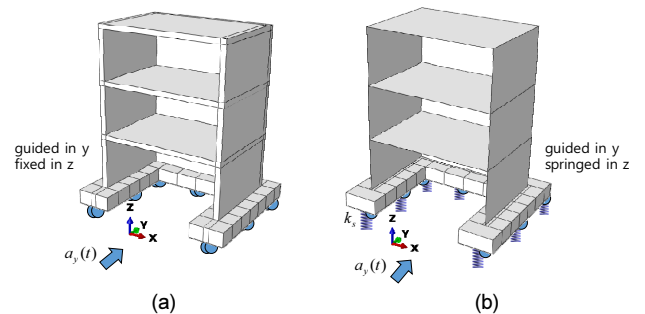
Concrete footing-shake table constraints: (a) fixed, (b) sprung with dashpots
